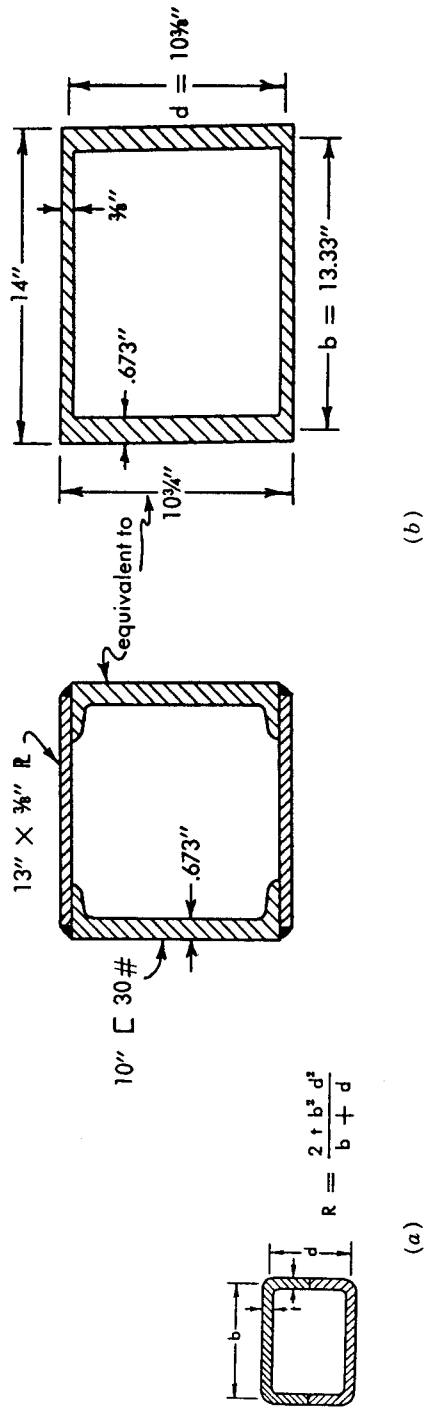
(a) Rectangular section with plates of uniform thickness; (b) rectangular box with plates of different thickness.
